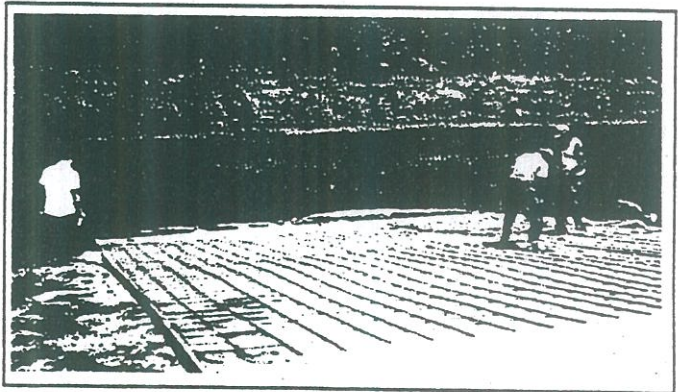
Cast-in-place concrete ramp (SOBA, 1989)
